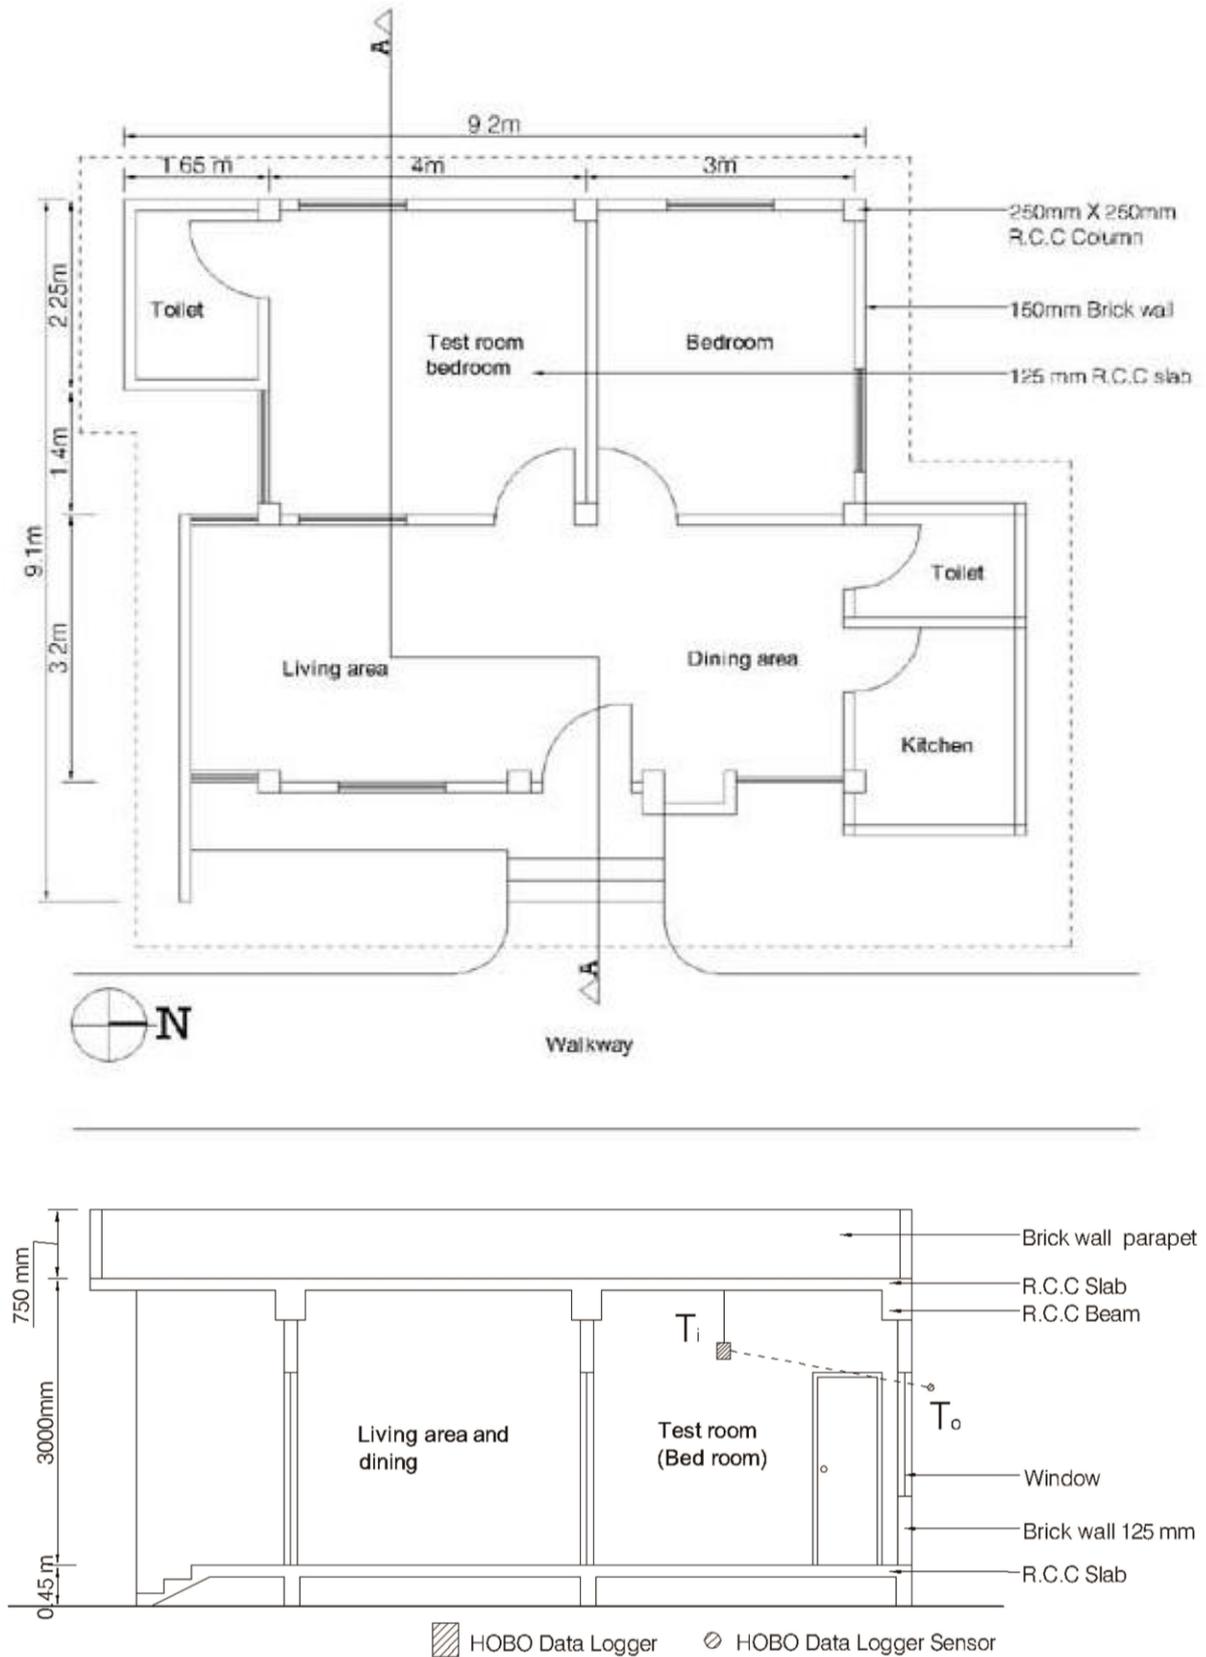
Plan and Section of typical contemporary designed house and the position of thermal data loggers and sensors.
